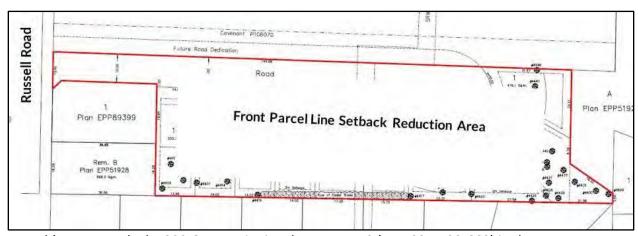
PLAN OF REDUCED SIDE SETBACKS
